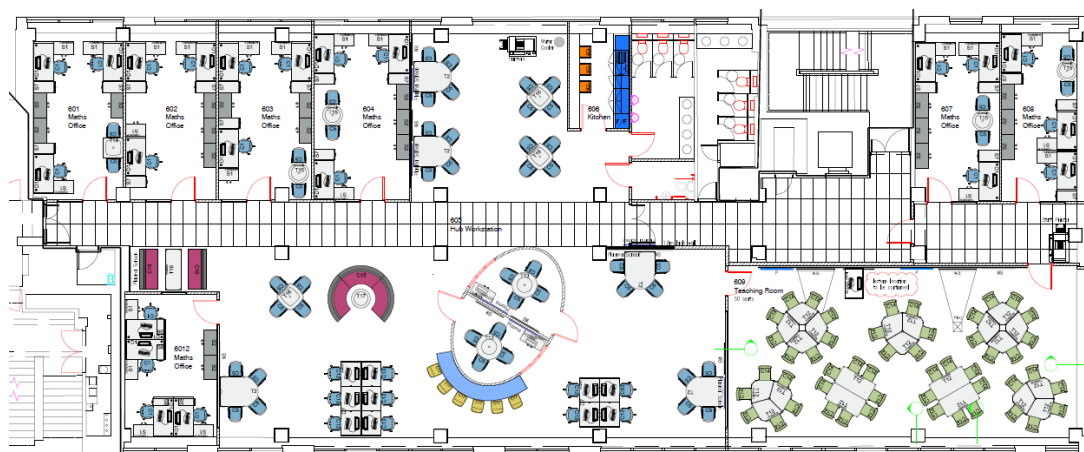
Floor plan of maths space (Waldock et al., 2016)
